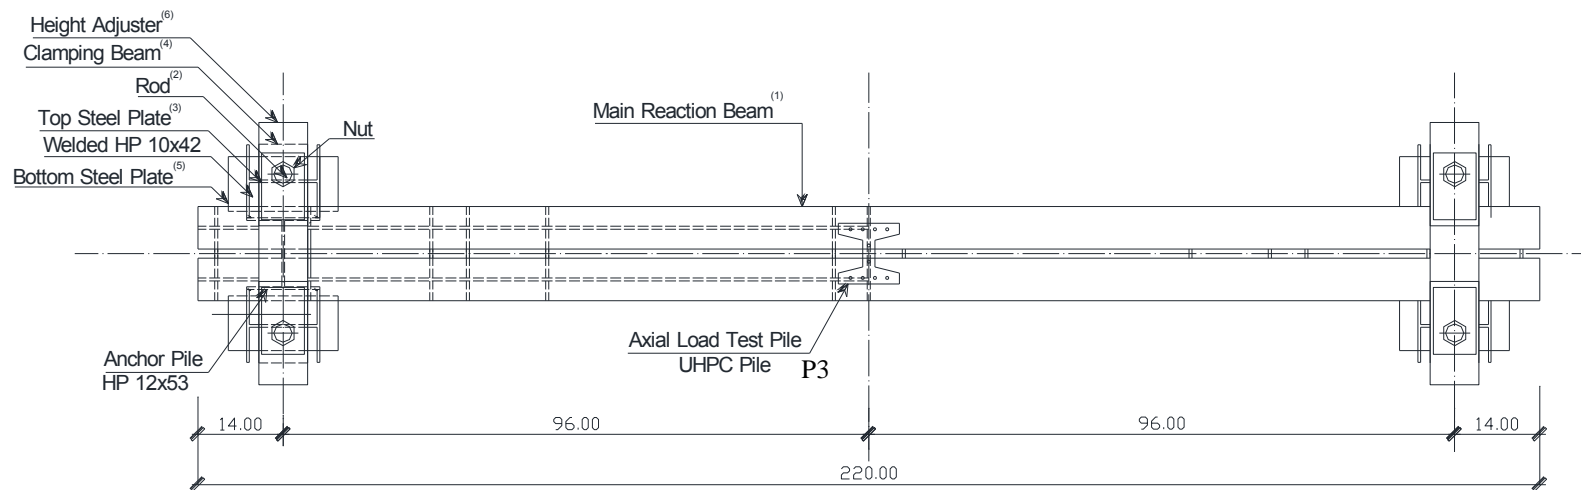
Top View of Vertical Load Test Setup (all dimensions are in inches)
